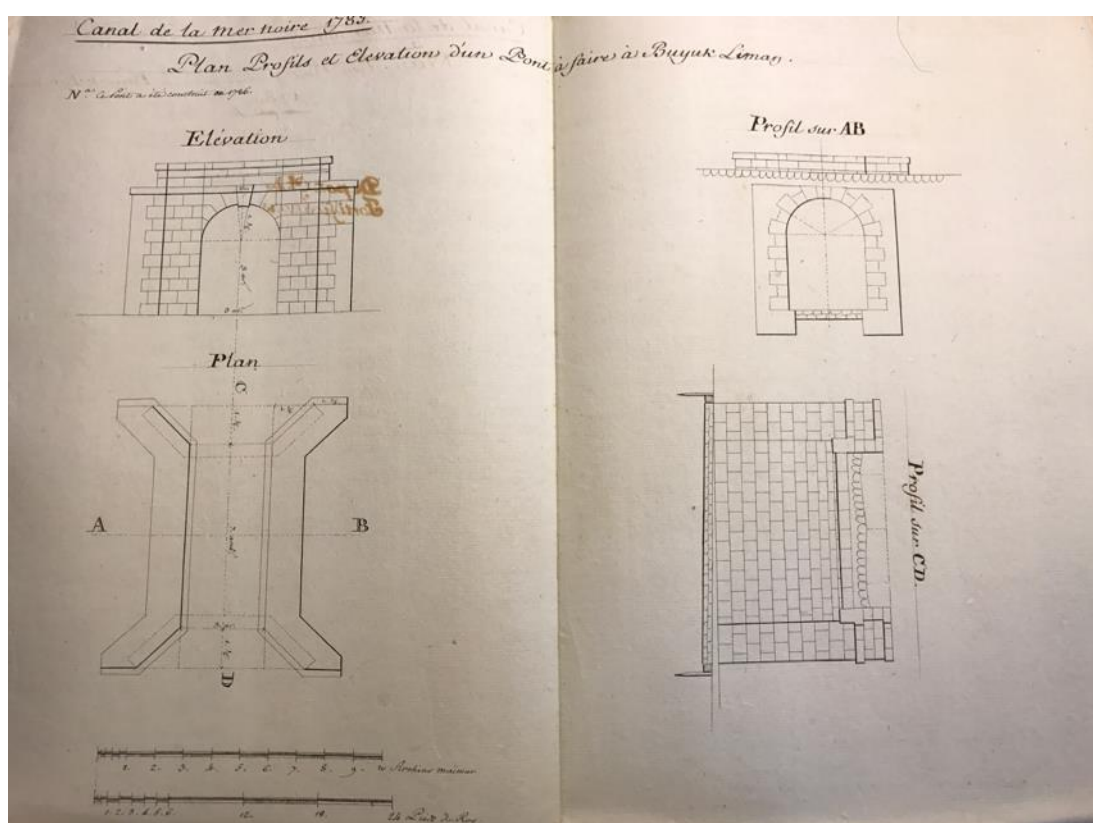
French Plan of a Bridge for Büyük Liman. “Plan Profils et Elevation d’un Pont à faire à Buyuk Liman.” (SHD, 1 VM 275, 22, N. 5)
